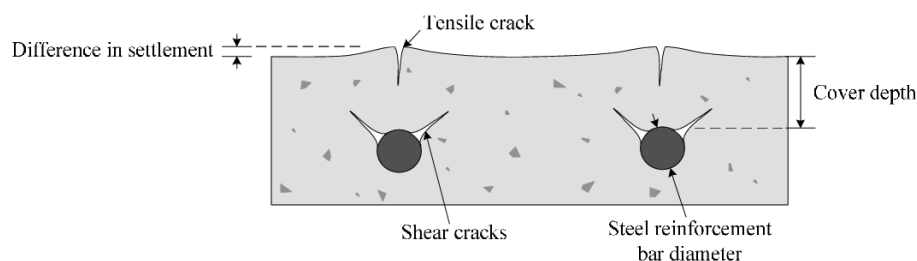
Demonstration of shear cracks and tensile cracks in concrete due to plastic settlement (Combrinck and Boshoff, 2014)
